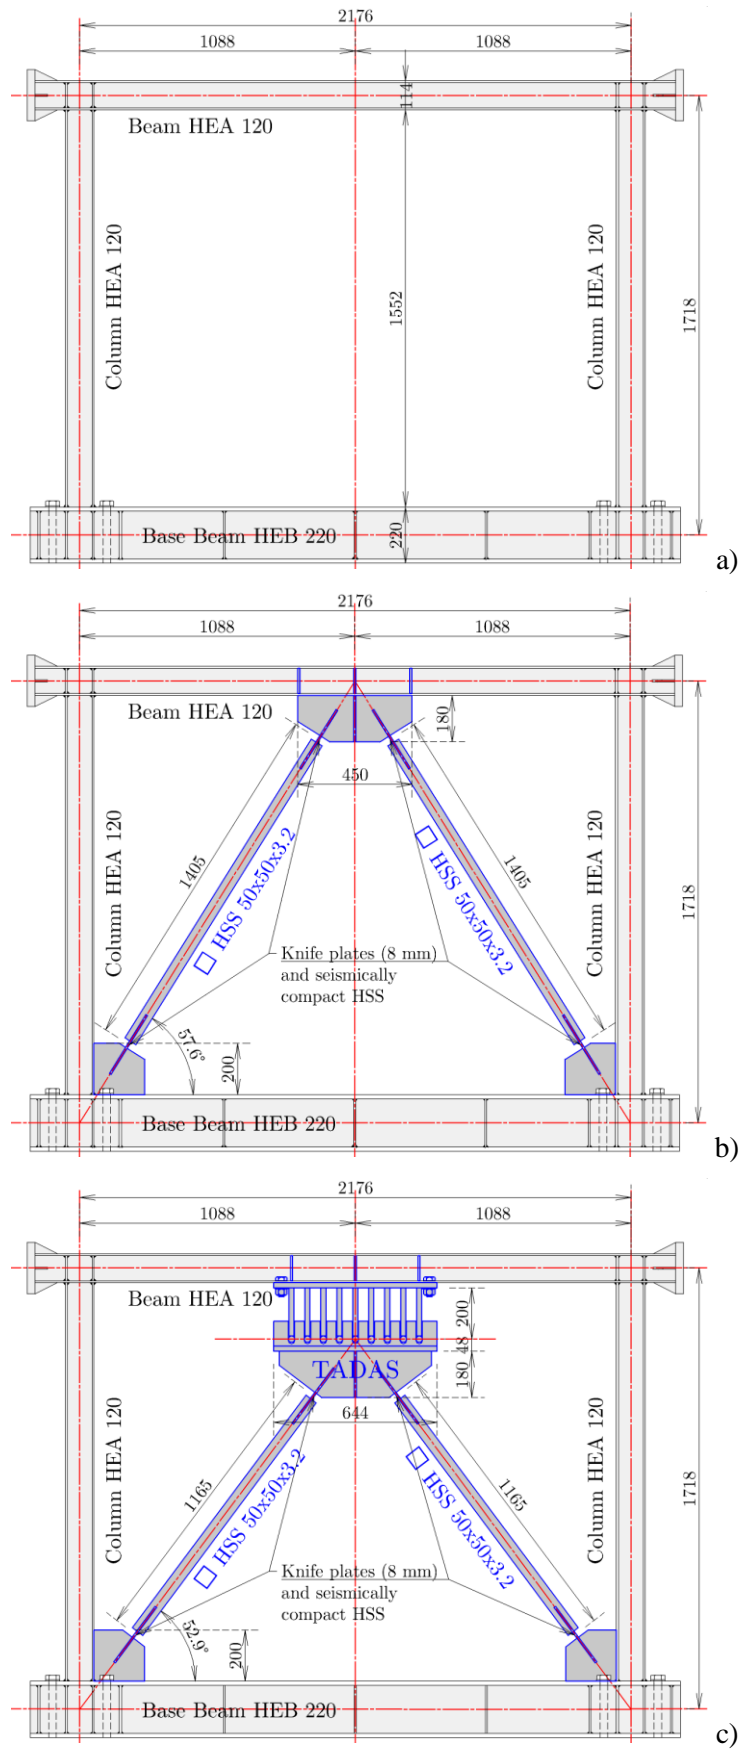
Geometries of test steel frames: a) Bare frame, b) Inverted V-braced/Chevron frame, c) TADAS frame
